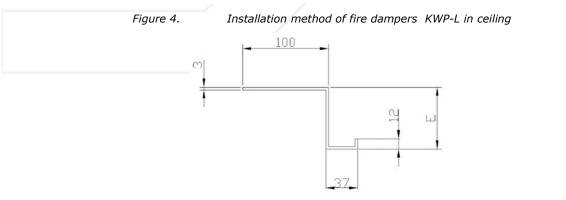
Proposed dimensions of mounting brackets for installation in a ceiling 140 mm thick;
